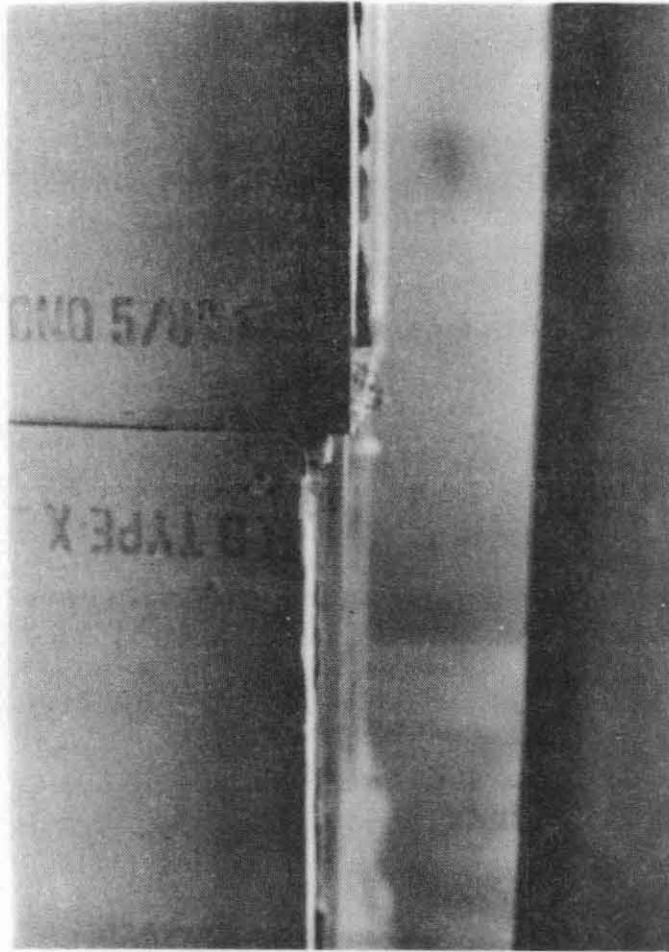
Partition Specimen P4: Typical Slippage Failure @ Horizontal Joint
